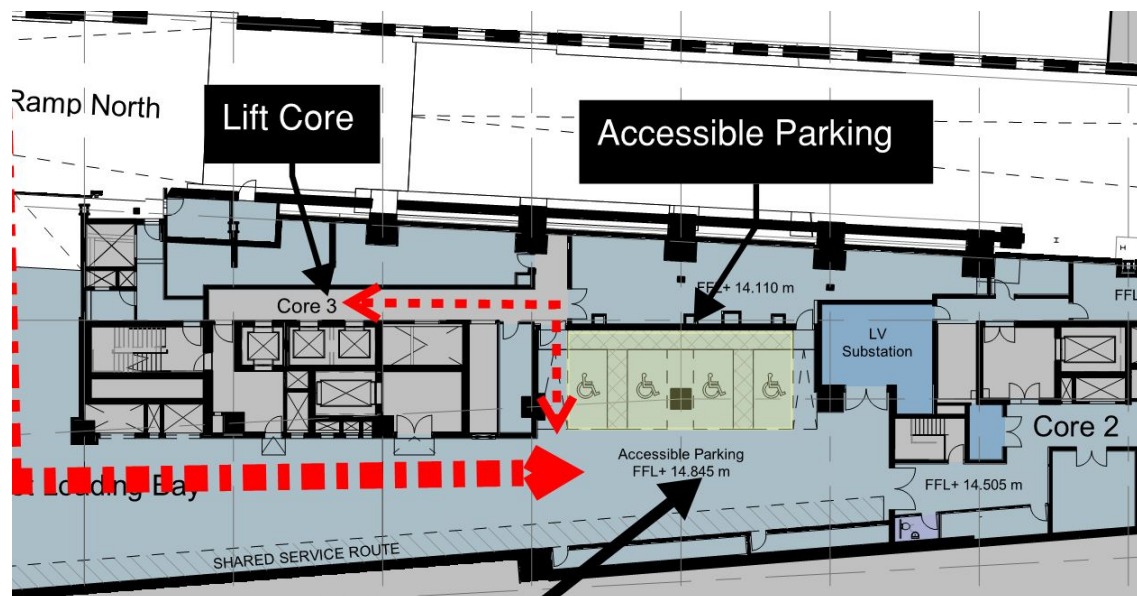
Upper basement plan extract showing access from accessible parking bays into the building via Core 3
